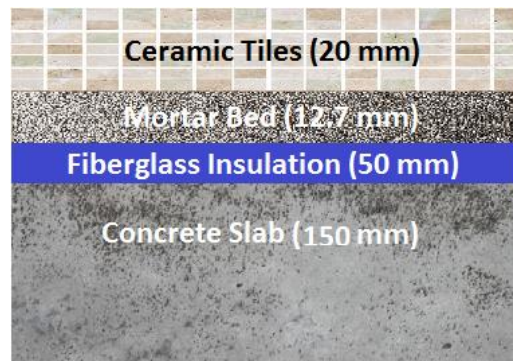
A typical floor cross-section. The ground floor and lobby areas floor cross-section.
